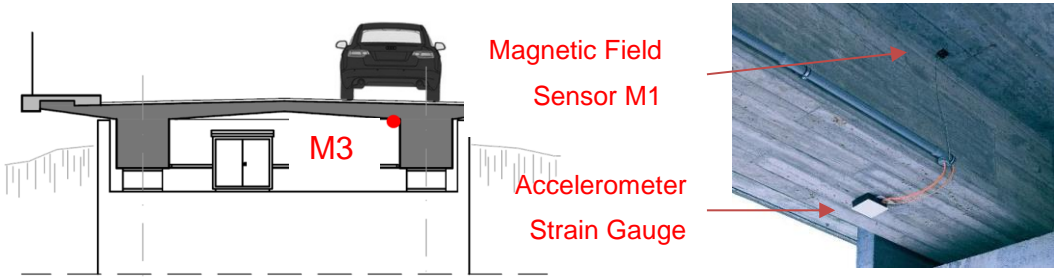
Location Magnetic Field Sensors; left: Cross Section, right: Installed Sensors
